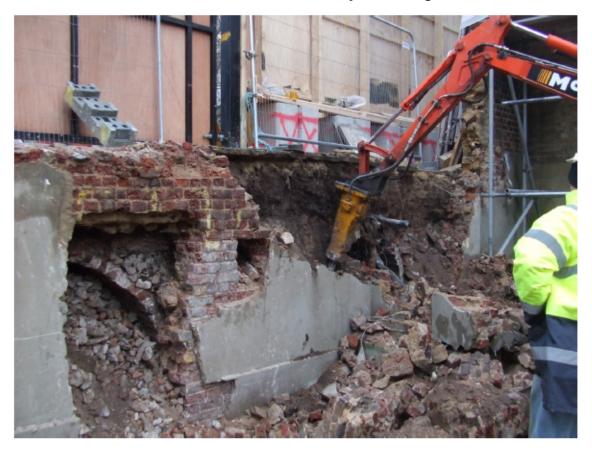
South elevation of the boundary wall during demolition, looking north-east
